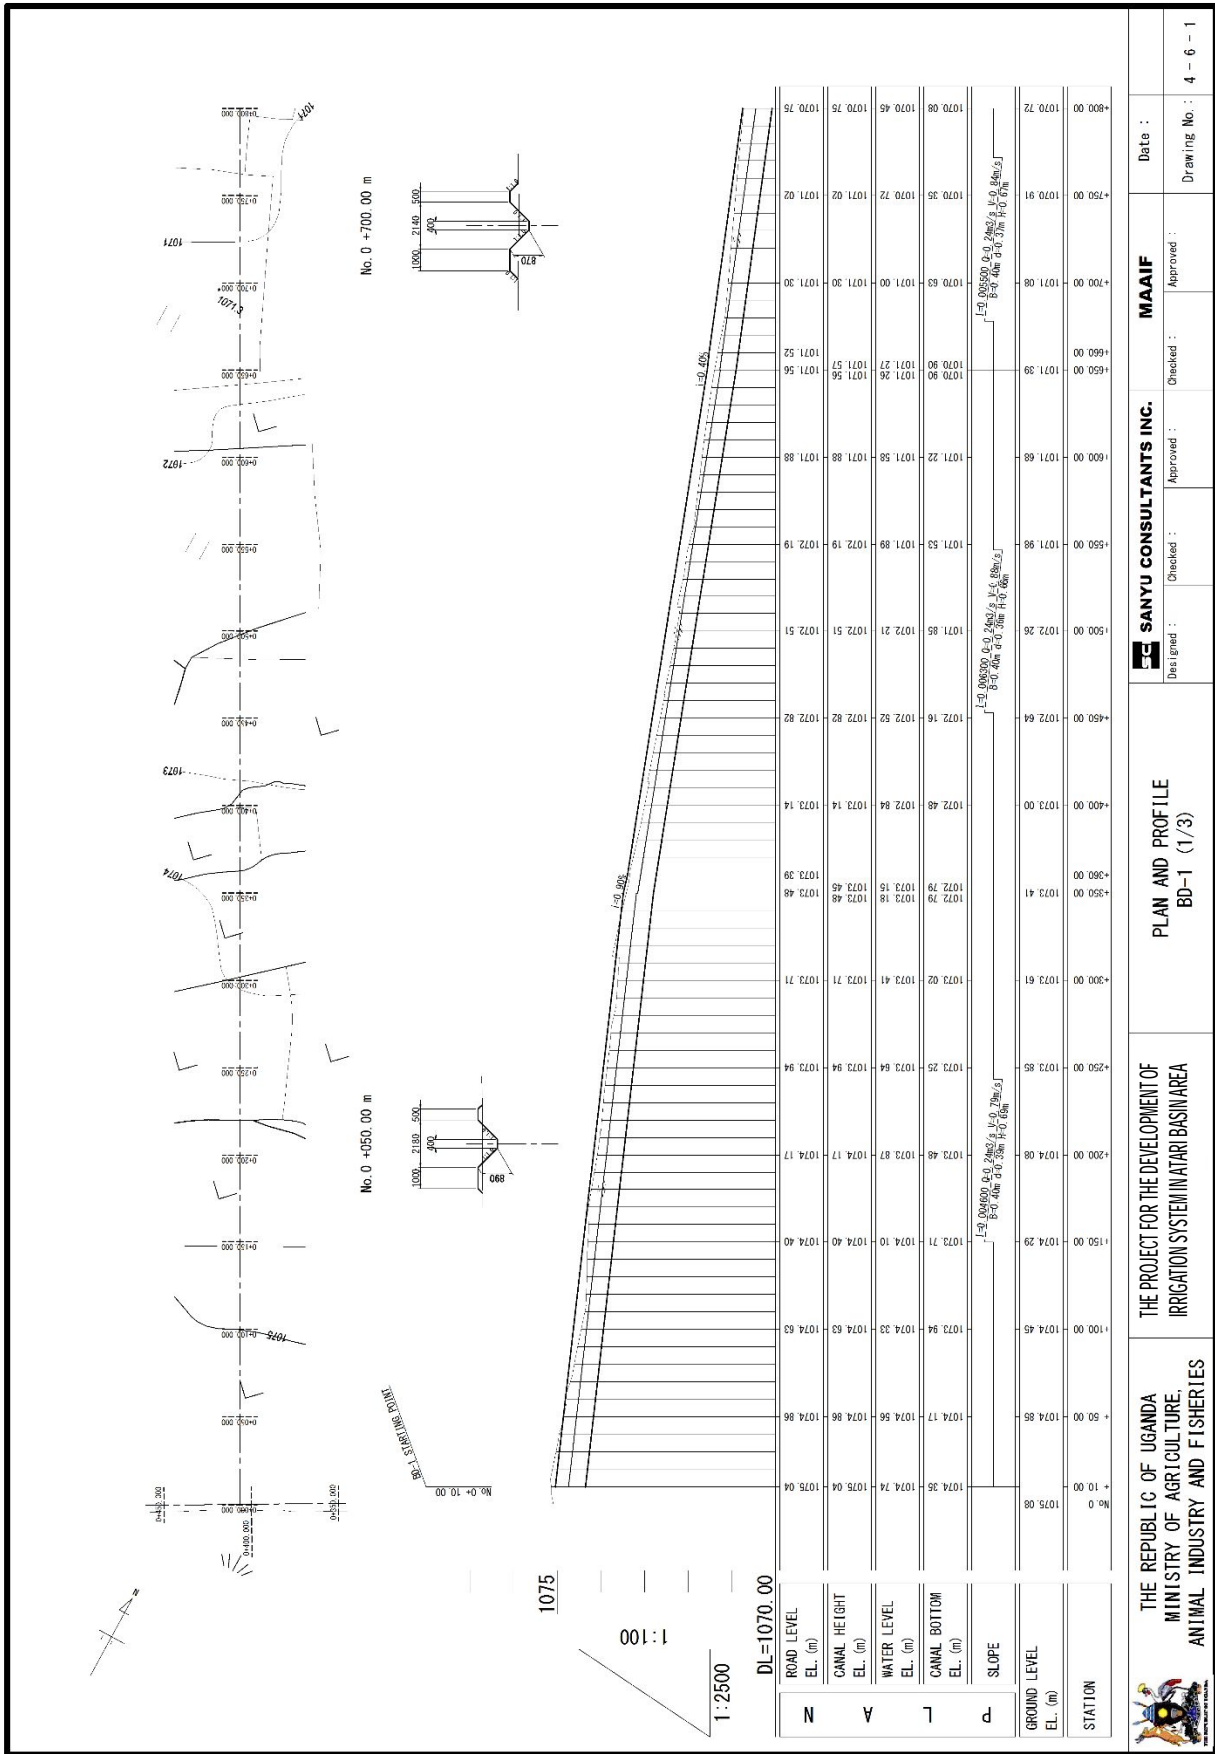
Longitudinal Profile of BD-1 (1/3)
